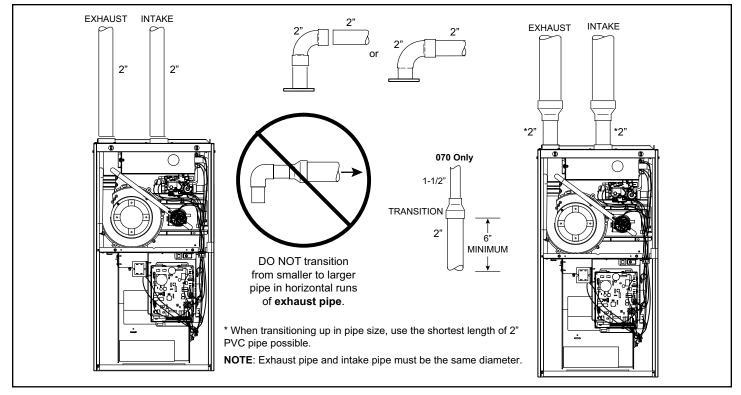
Typical Exhaust and Intake Pipe Connections and Condensate Trap Installation in Upflow Applications
